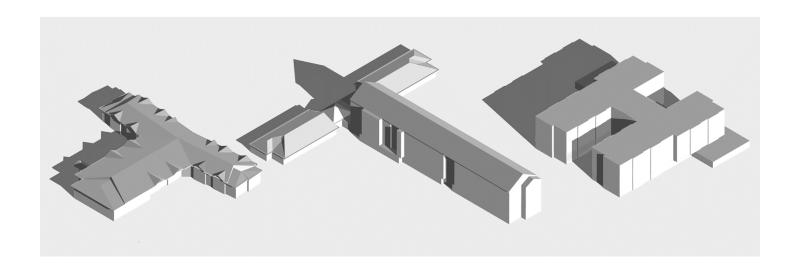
3D Architectural Models of Three Dementia Care Buildings Slave lake building model (left); Wainwright building model (middle); Red Deer building model (right)
